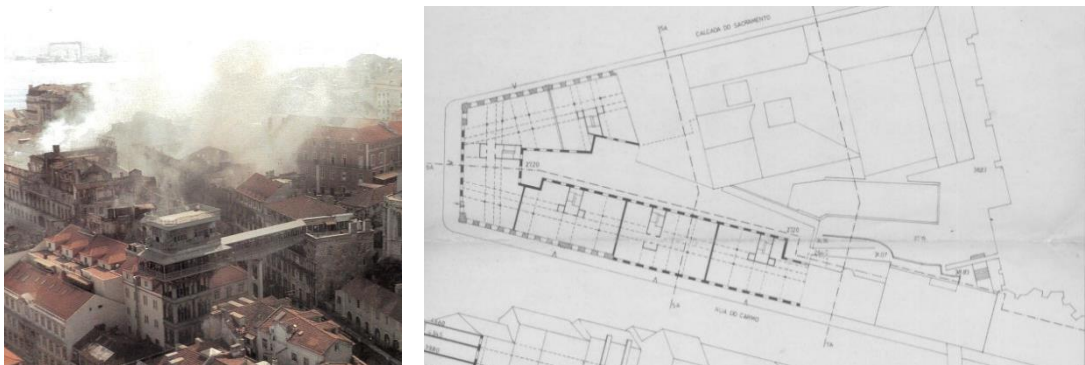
Photo after the fire ([3]. Plan of the Block B, showing two types of interventions for the façades: " to restore" (thicker walls) and "to rebuild" (thinner walls) (Álvaro Siza, 1996).
